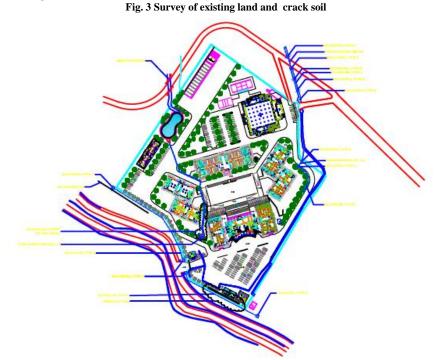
Site Plan of government institution consists of 11 building offices, class
